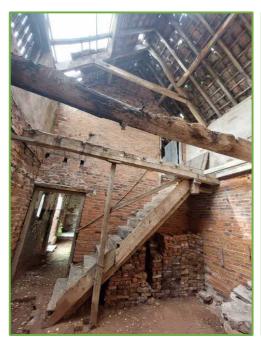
(left) showing large missing section of roof and missing floors. Photo 3 (right) Showing large gaps I the pitched roof and missing floors
